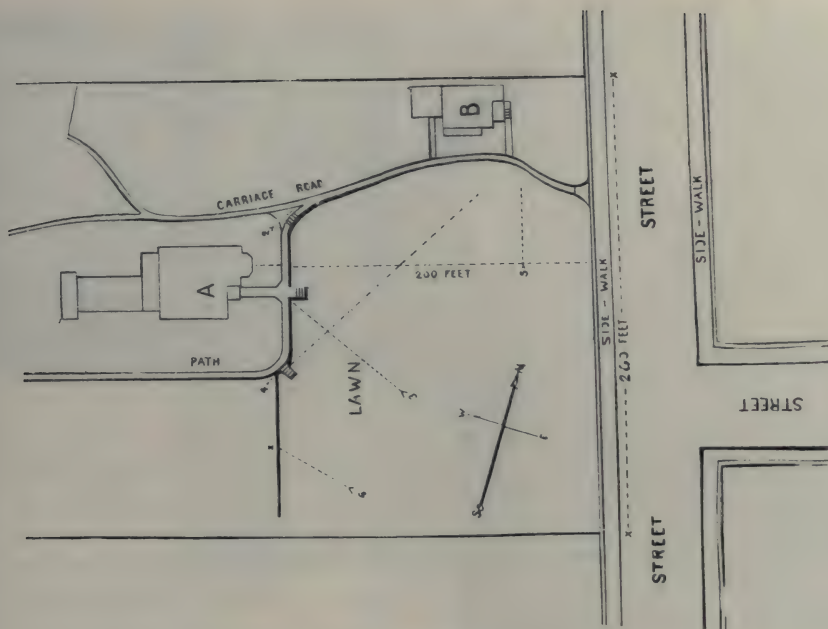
PLAN OF MR. BEALL'S GROUNDS.
